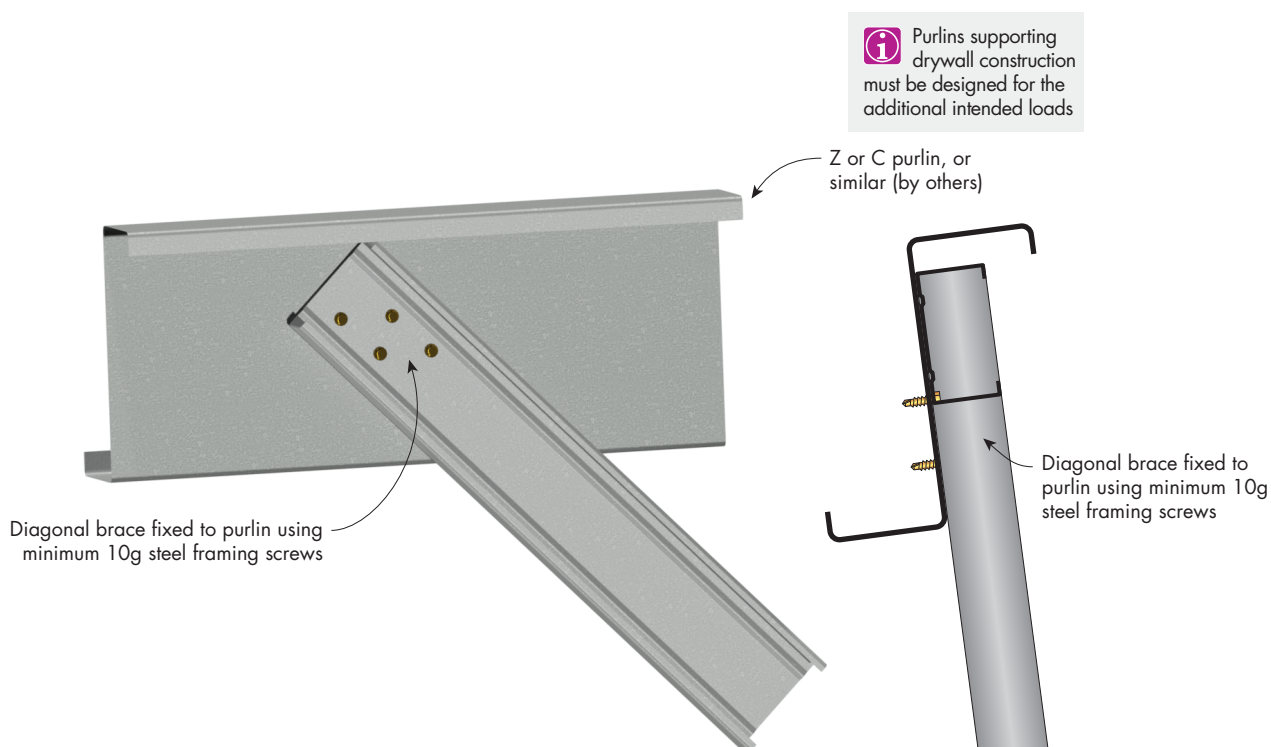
Diagonal Brace to Bridging between Purlins
